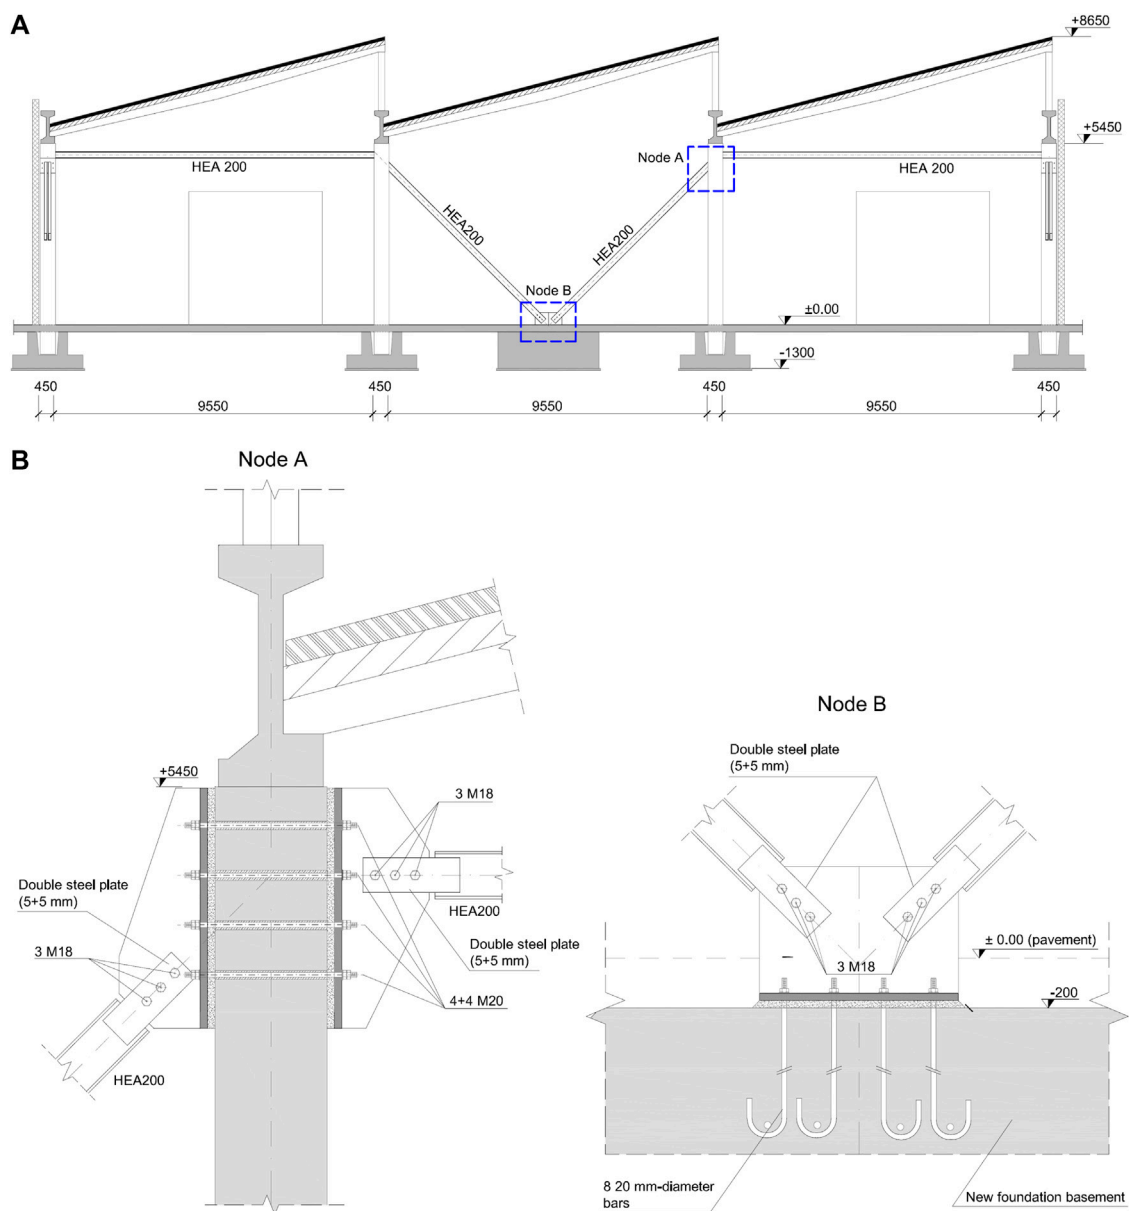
| V-shaped steel bracing used to stiffen four columns in a precast building with shed-type roof: (A) front view; detail view of (B) bracing-to-column and (C) bracing-to-foundation nodes. Dimensions in mm.
